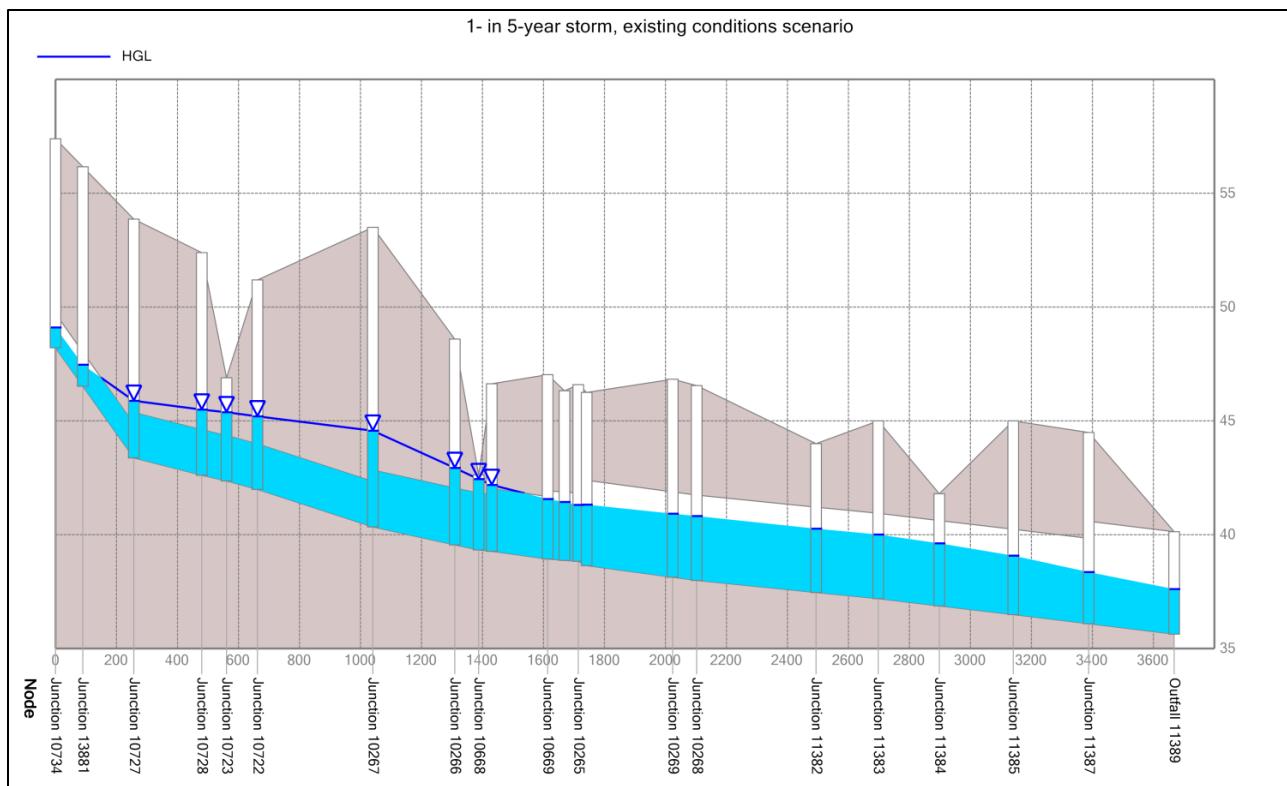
Highway 99E sewer profile – Main Street to 15th Street
